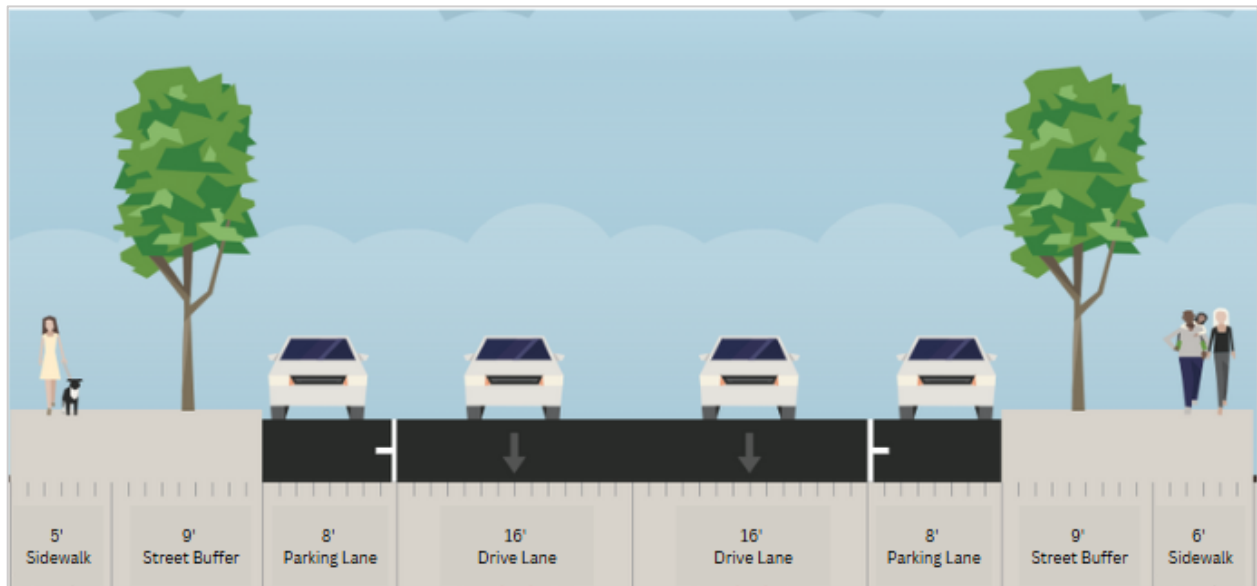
Proposed road cross-section of Automobile Boulevard, as conditioned
